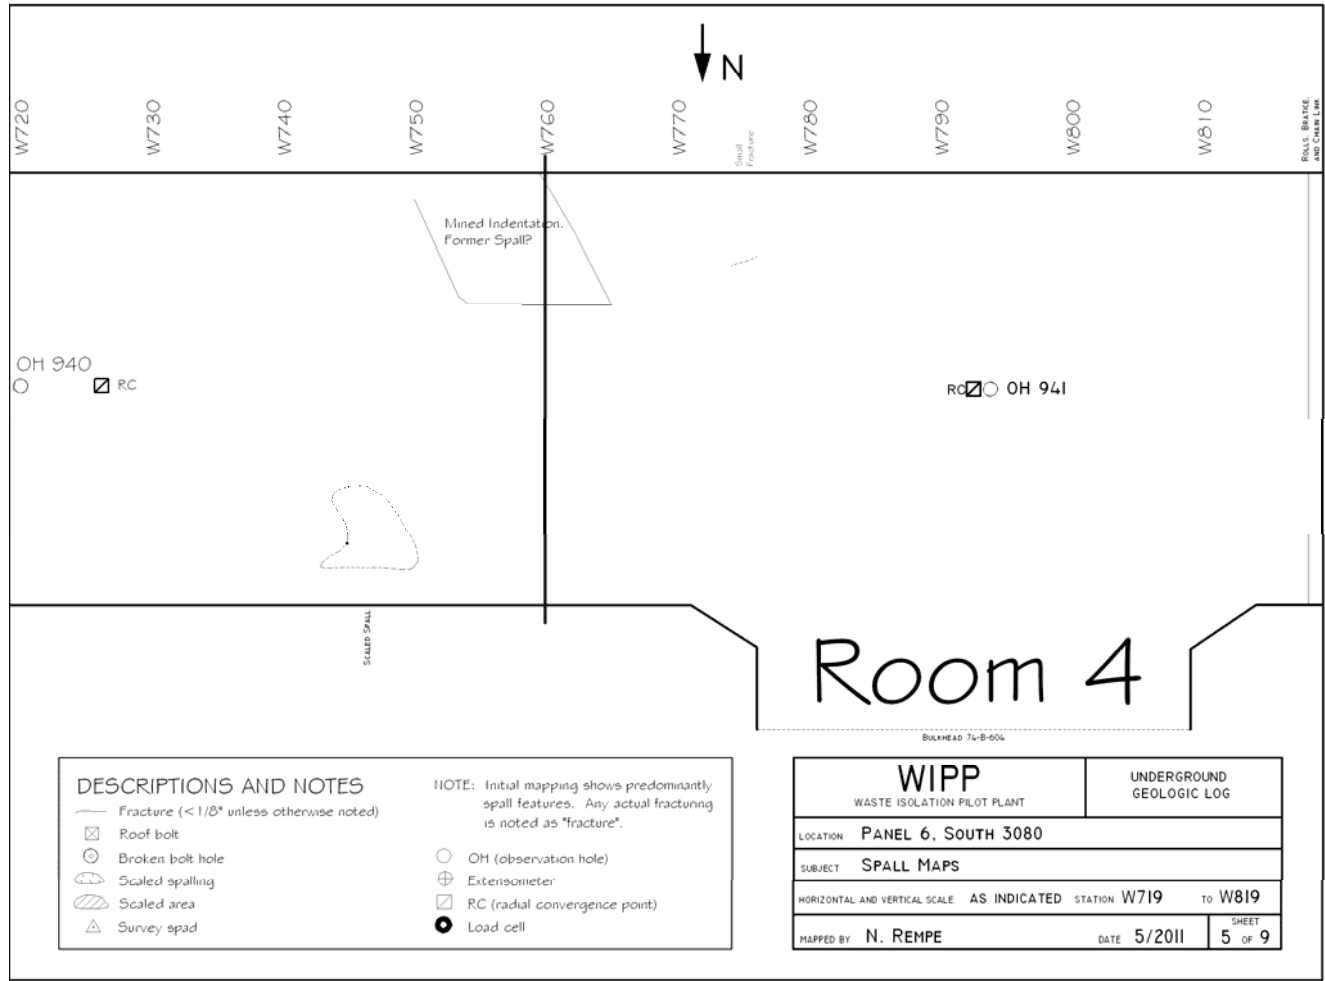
Panel 6 S3080, W390-W1210 Roof Fractures (Sheet 5 of 9)
